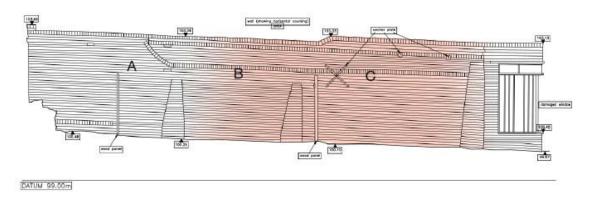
North end of the boundary wall as viewed from No. 22 Frognal Way. (Structurally unstable sections of the wall highlighted in red)
